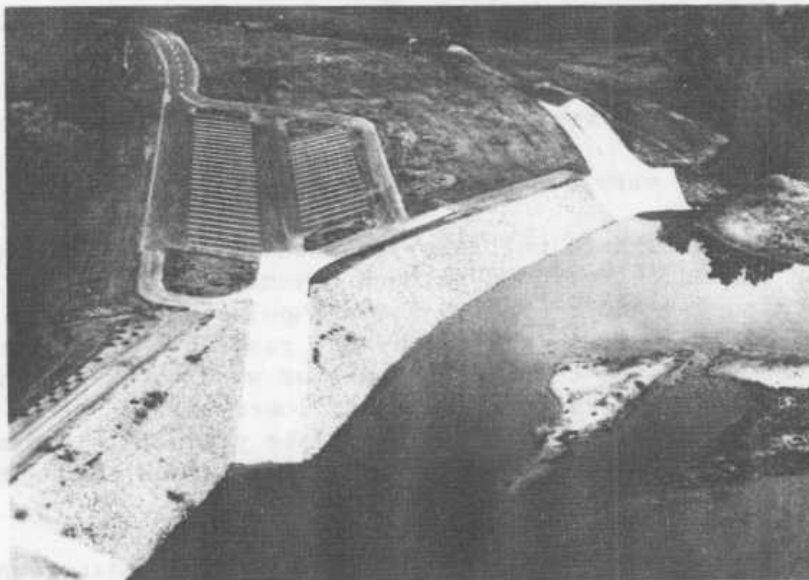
Access, Circulation, and Parking at a Boat Ramp
